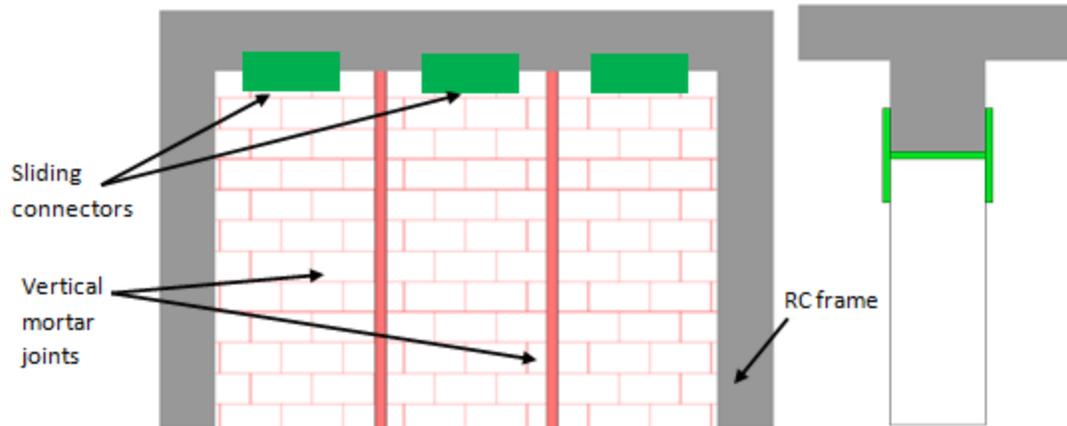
Infill masonry walls divided by vertical mortar joints and sliding connectors
